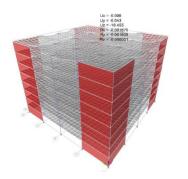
G+6 Building RCC Shear wall on outer peripheral corners
